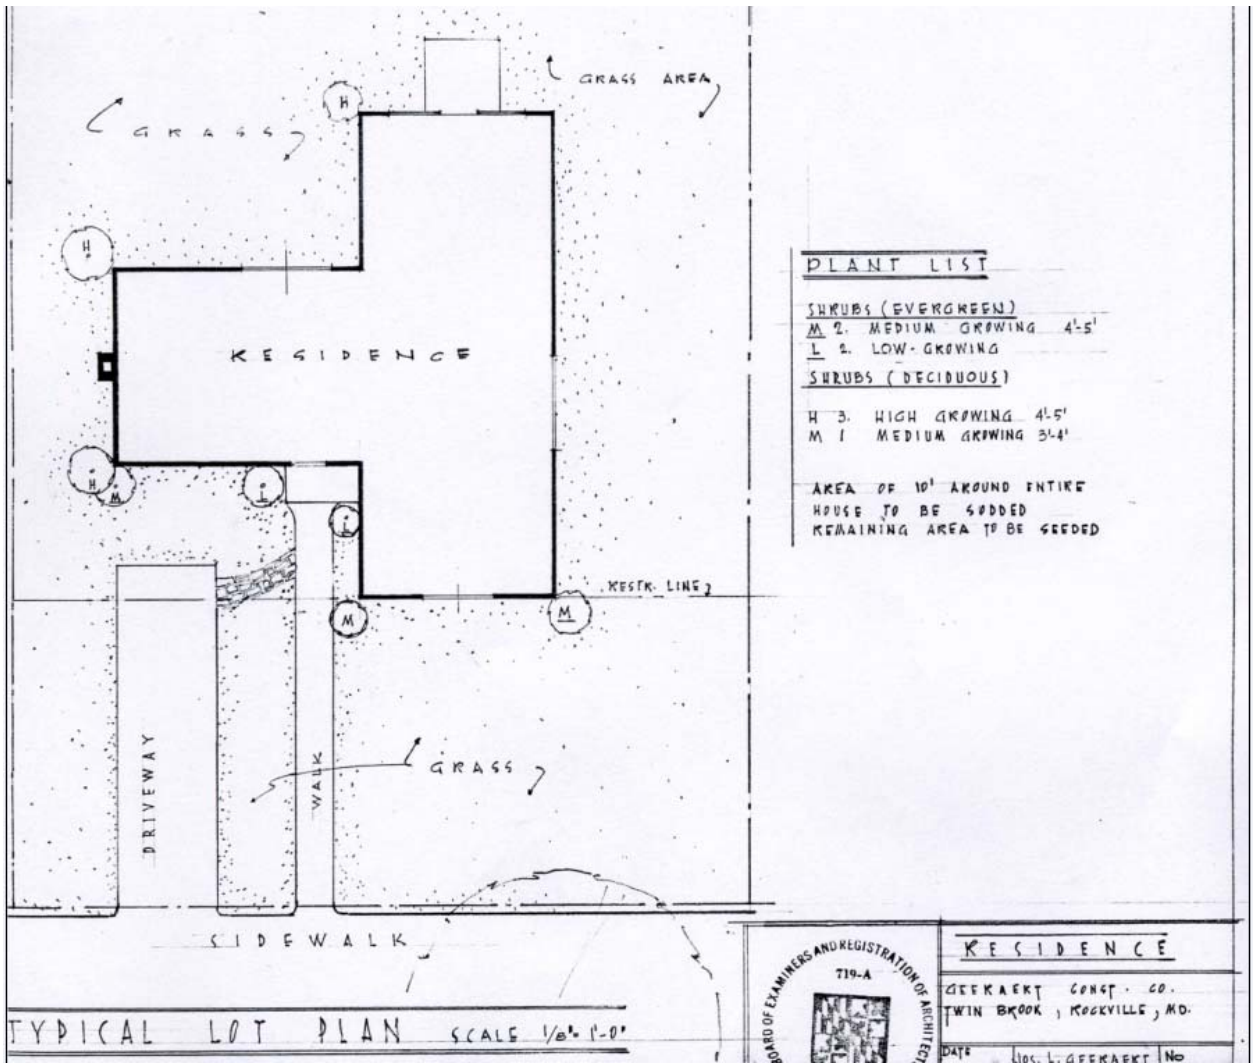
, "Plant List" for a typical Twinbrook lot plan, from Peerless Rockville Archives
